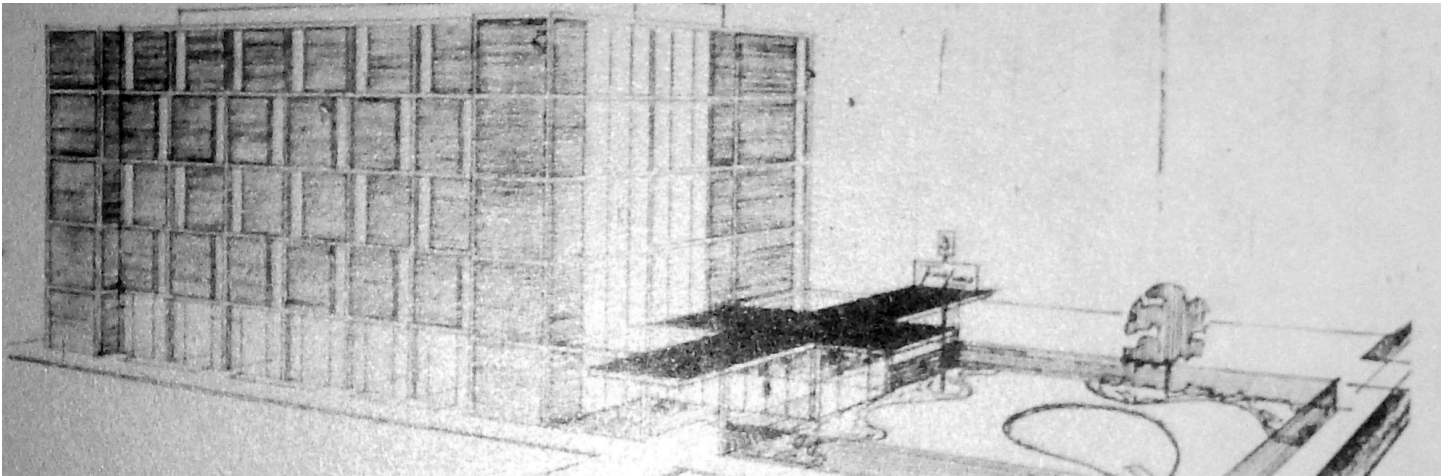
Travel Lodge Motel, Brady and West 16<sup>th</sup> streets, Davenport, New Town Centre, 1964. Architects Stewart, Robison, Laffan (Davenport *Democrat and Leader*, August 2, 1963)
